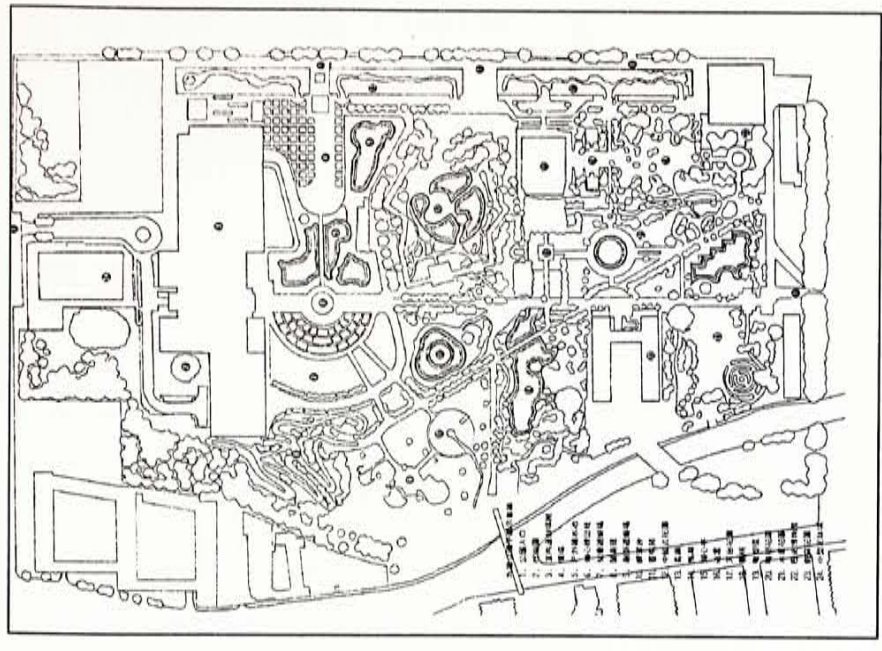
Master layout plan of Kowloon Park¹⁷
